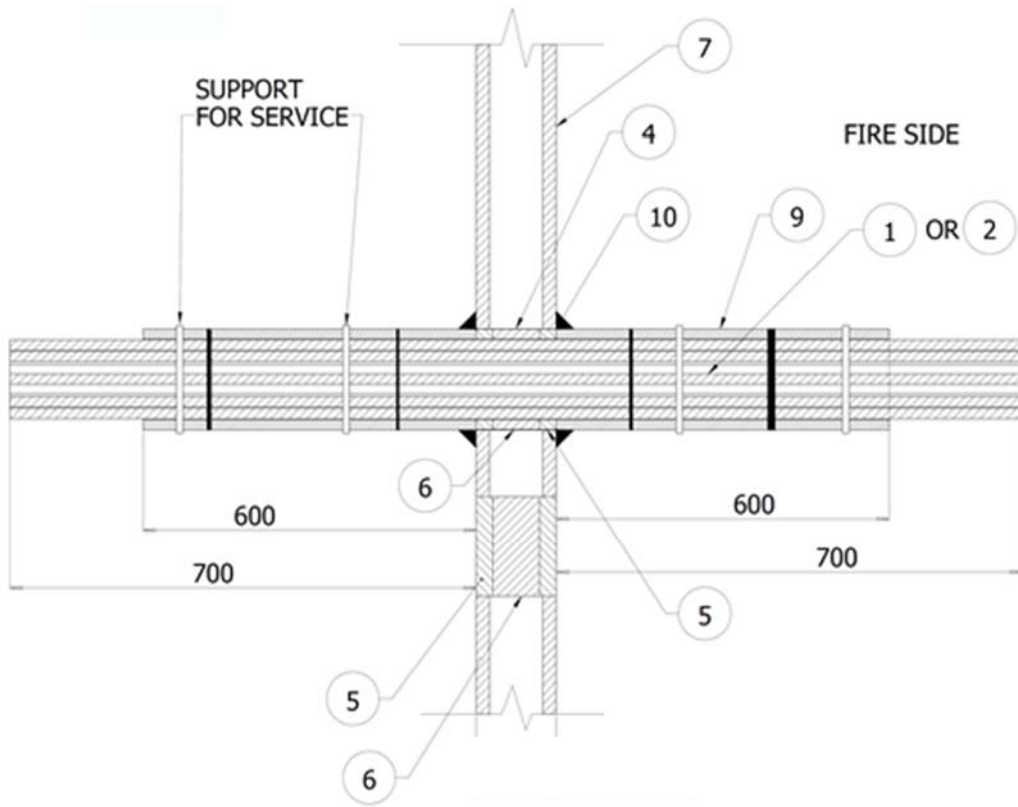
Typical detail for wrapped cables in plasterboard lined walls
